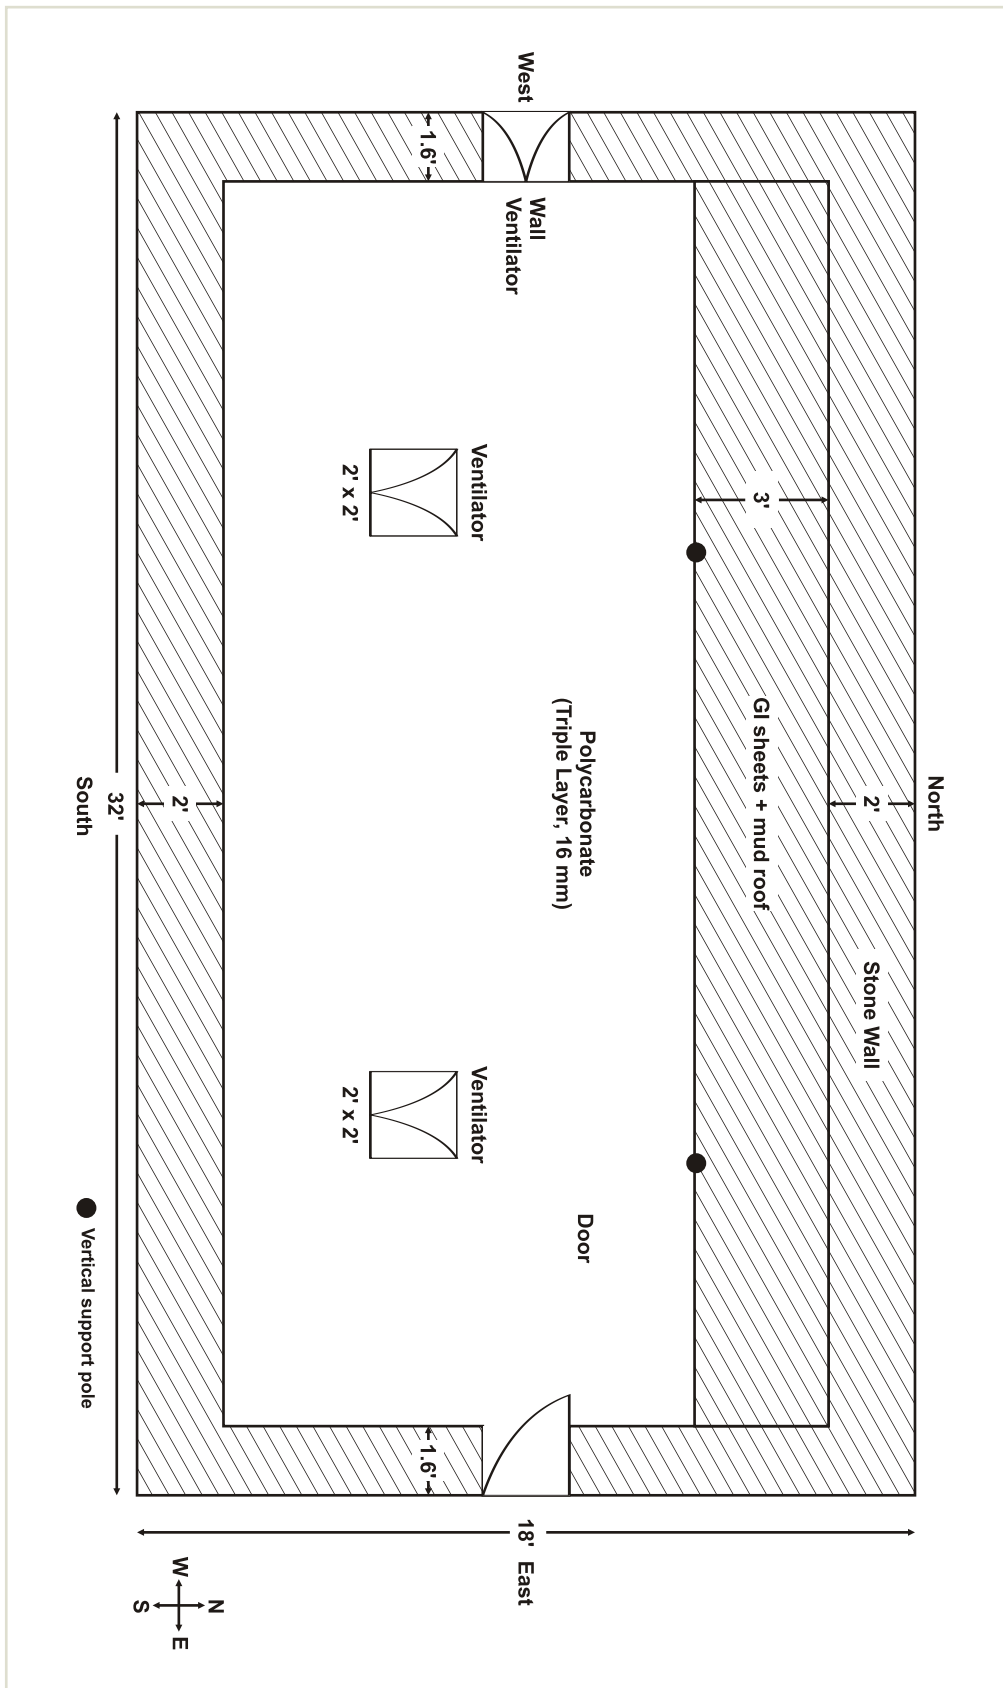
(c): Top view of Domestic Type Ladakh Greenhouse (32'x18'; single stone wall)
